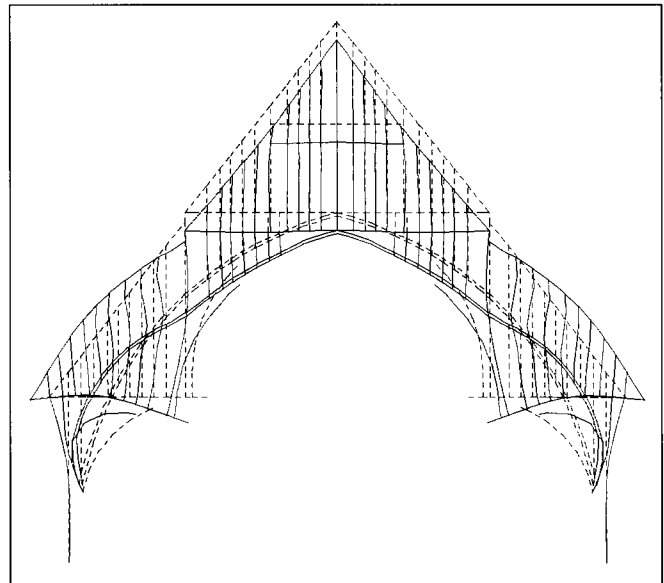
Westminster Hall roof, finite element model showing deflected shape in traceried truss caused by vertical loading. FIGURE 11: Westminster Hall roof, finite element model showing axial forces in traceried truss.
